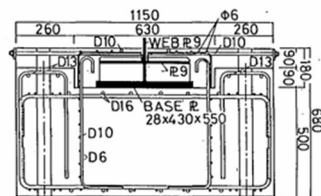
(a) Transverse section of A-Type specimen (A-A section of Fig. 2(a)) (unit mm)
